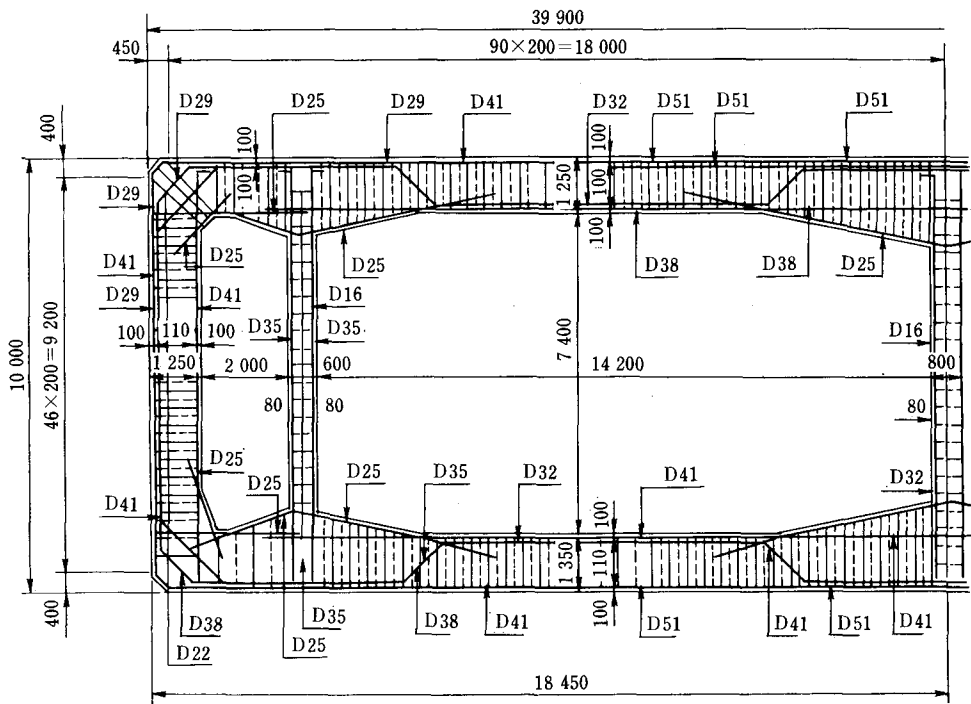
Standard arrangements of reinforcing bars in tunnel element
